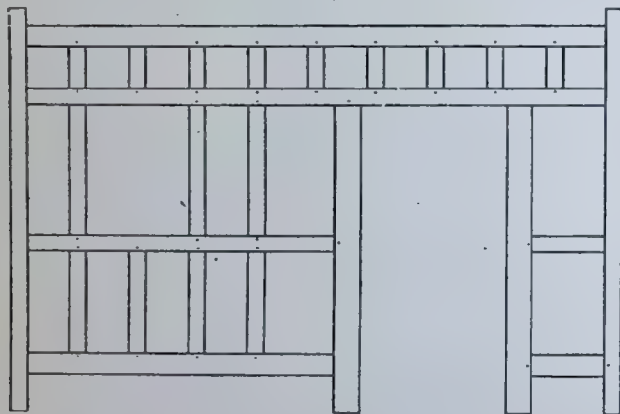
ELEVATION OF PANELLING FOR DOOR SIDE OF ROOM.
